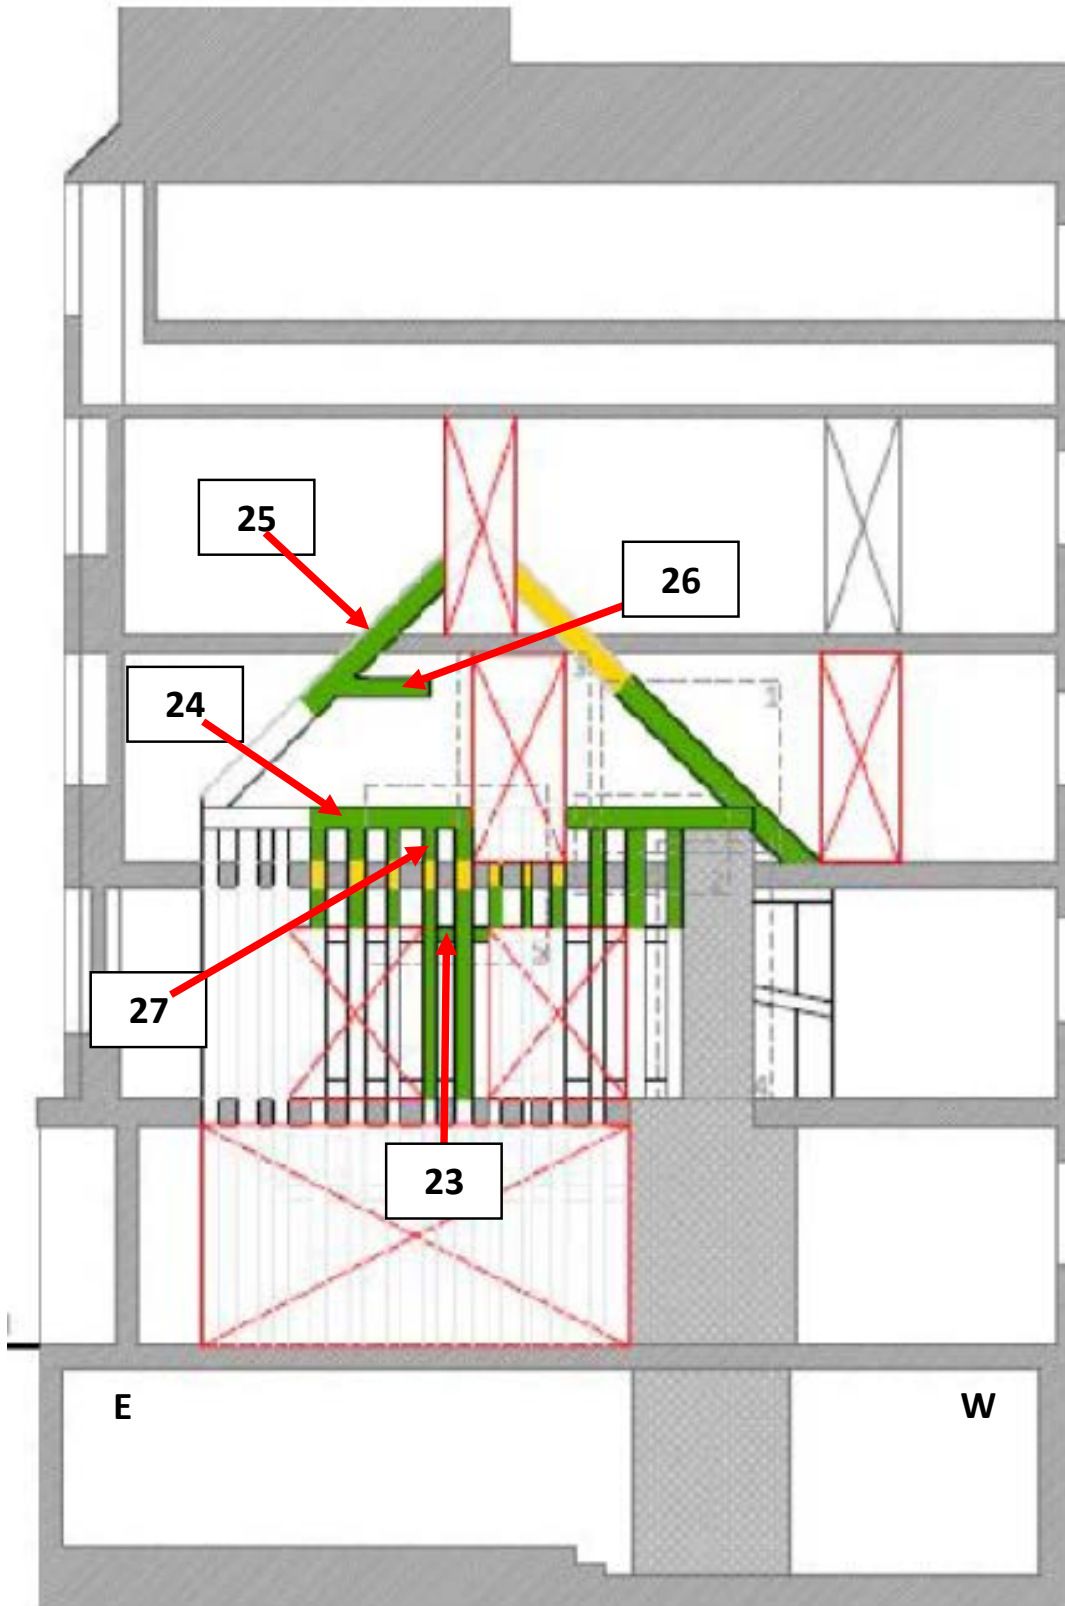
Section through the Well House looking north–south to help locate sampled timbers EXT-L23–EXT-L27 (after Buttress, Architects)
